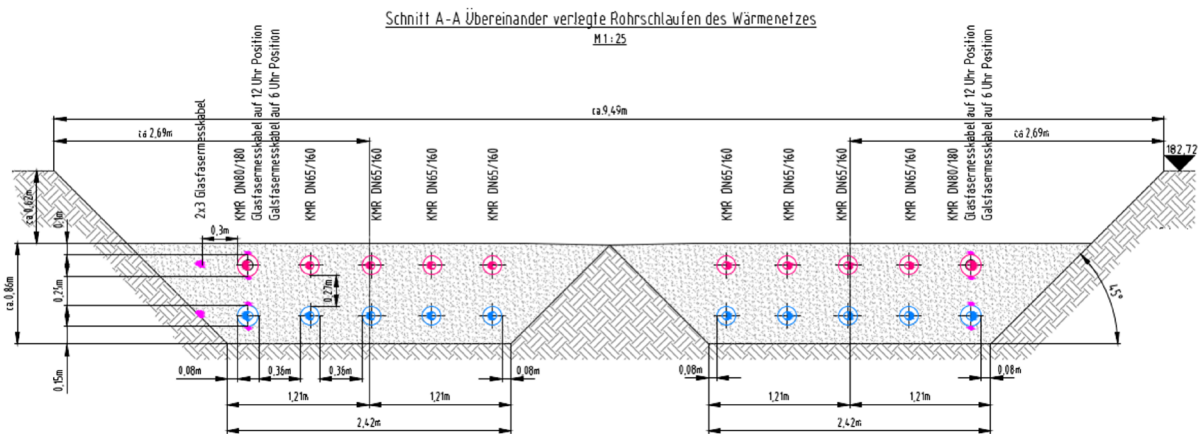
Cross-section of the flexible test grid and route of the fibre-optic measuring cable on the outer pipes
